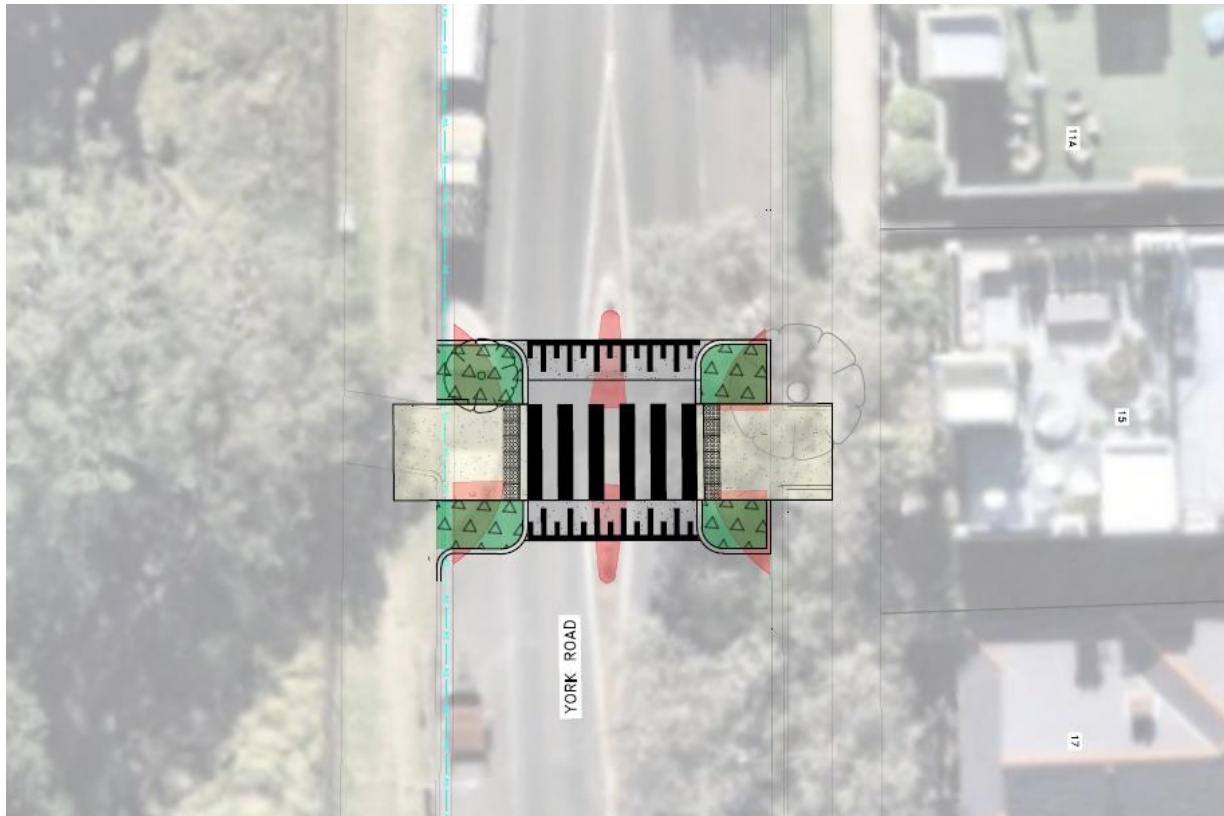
Raised pedestrian crossing in York Road, north of Birrell Street.
